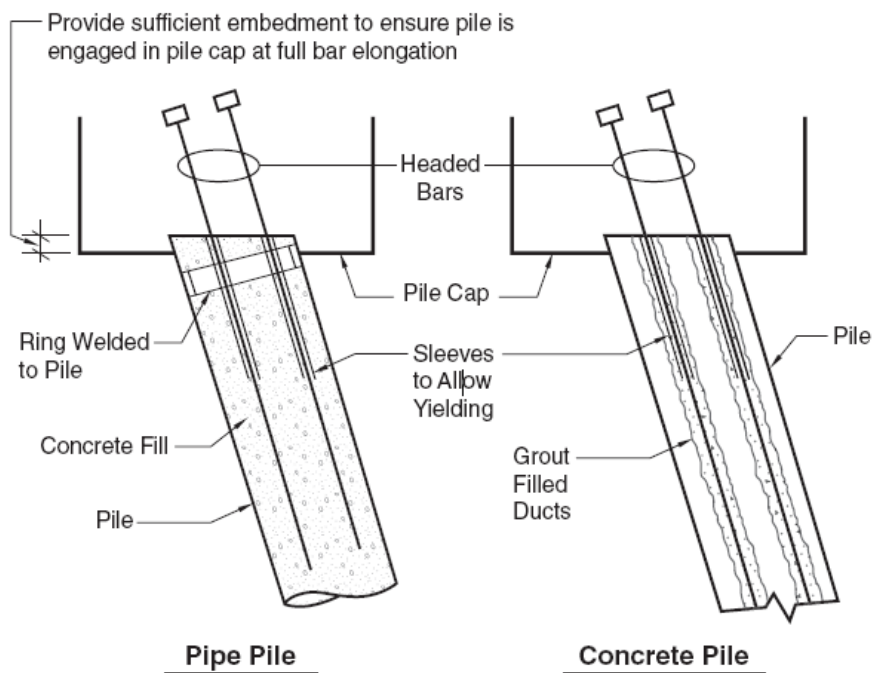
Sample tension fuse details for concrete and pipe piles (Harn, 2004)
